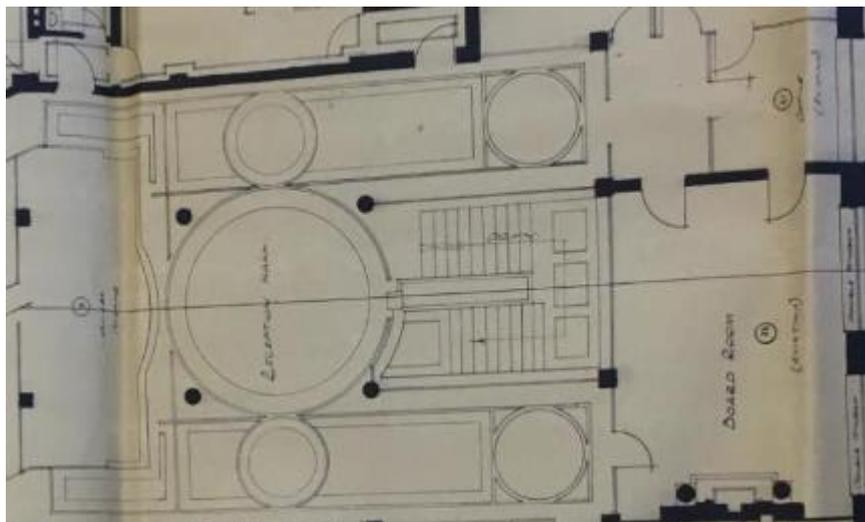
1939 First floor ground plan. Note 'cashiers desk' to the left of the reception hall, suggesting this hall was not enclosed from the full expanse of the office floor to the left.
